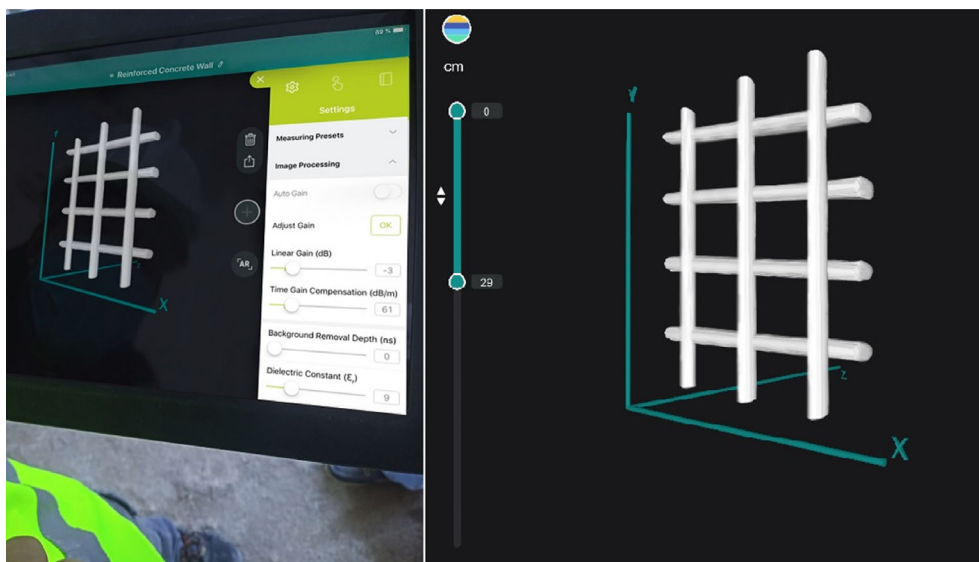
Process of obtaining the reinforcement of the concrete wall by means of GPR
